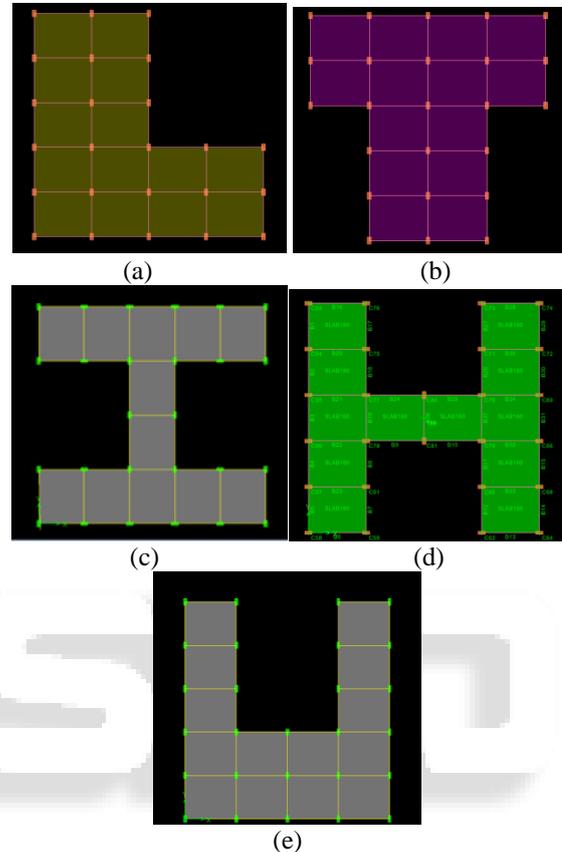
Plan (a) L shape (b) T shape (c) I shape (d) H shape (e) U shape of the Building
